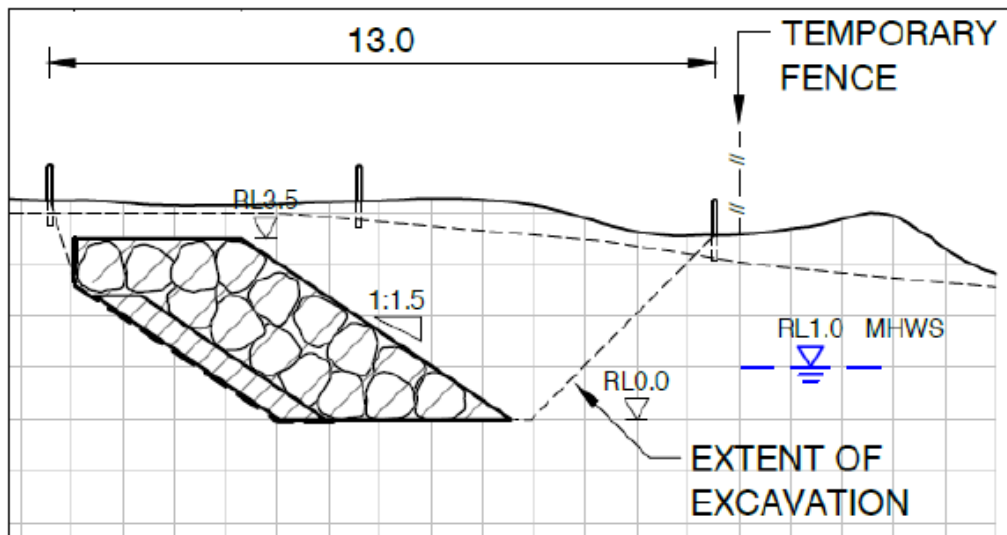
Indicative cross sectional area of excavation to place the structure in the northern portion (Source: Construction Methodology).
